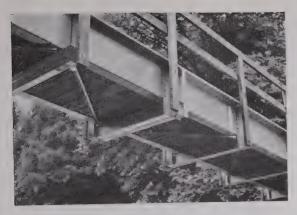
Grunder bridge: View of the stiffening girder from below
